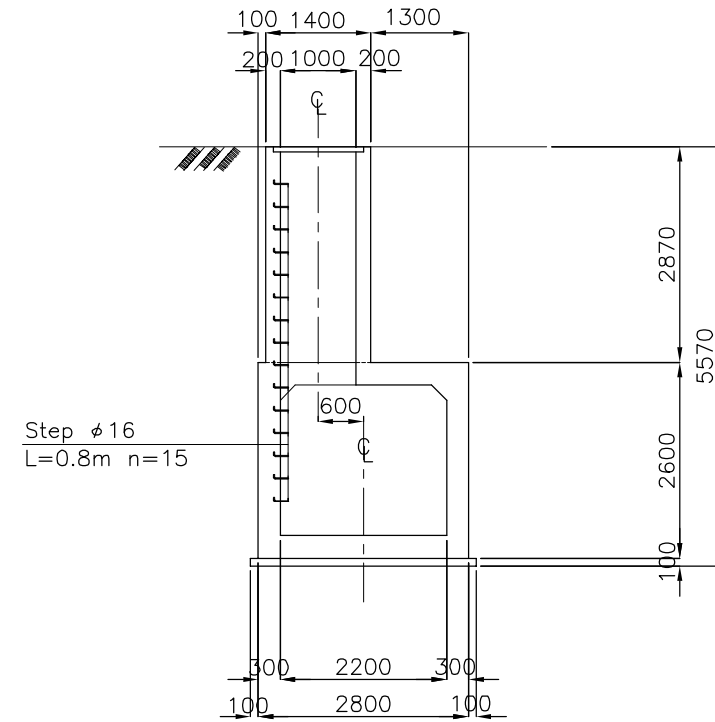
BOX CULVERT 2.0*1.8 S=1:200
